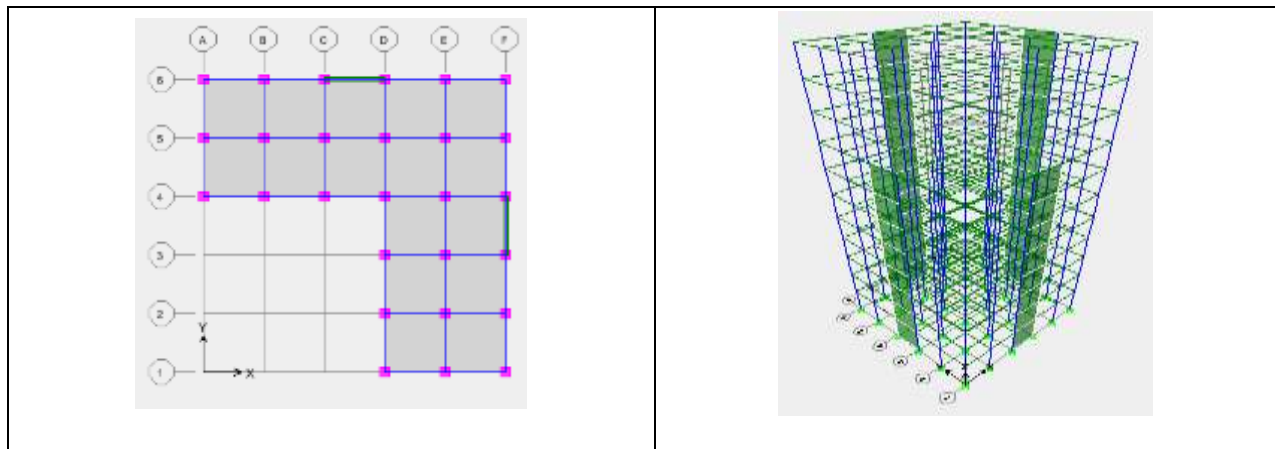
Plan Layout and 3D view of Asymmetric building Model-3
